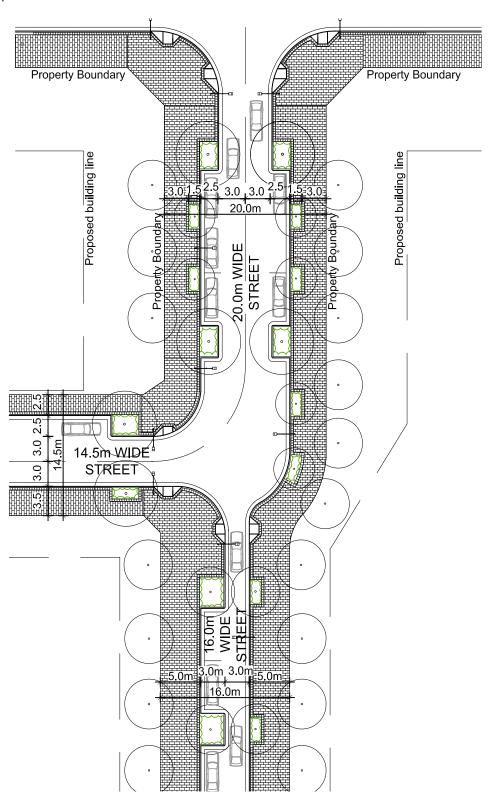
New 20-metre, 16-metre, and 14.5-metre wide street intersection (NOT TO SCALE)
